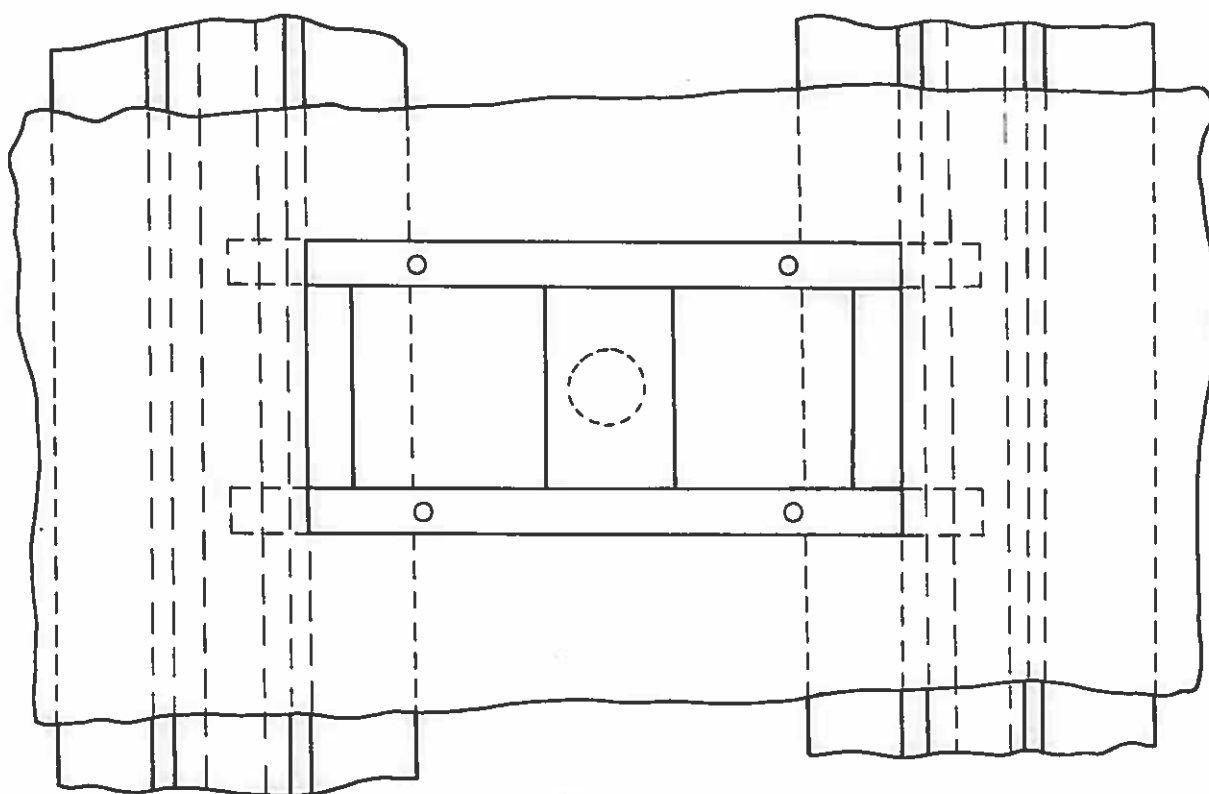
Reinforcement Details For Clinghans Bridge
